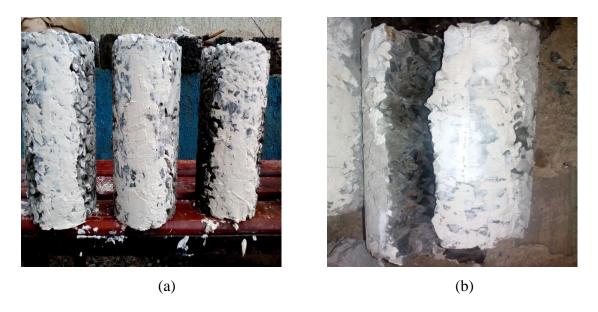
Gypsum lined specimens (a) Failed specimen under load (b)
